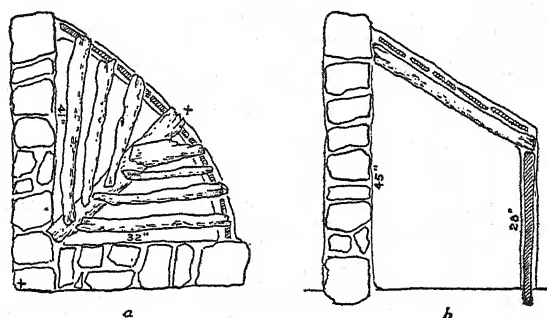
Corner storage bin in S A Canyon, Cliff Ruin 1, *a*, plan and the way the roof sticks rested on sloping ridge pole and adobe-coated stone wall slabs; *b*, section through *x-x*; dimensions indicated.
